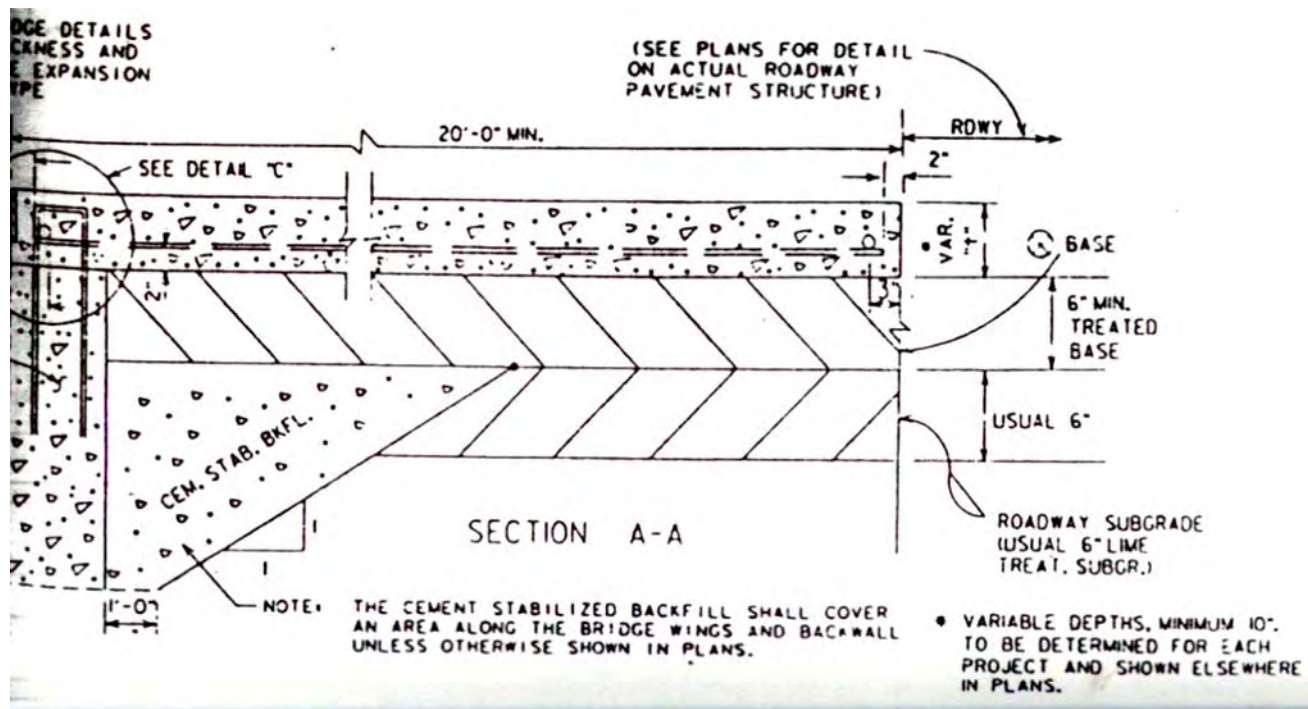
Bridge End Detail Showing Cement Stabilized Sand (CSS) Wedge Behind Abutment
